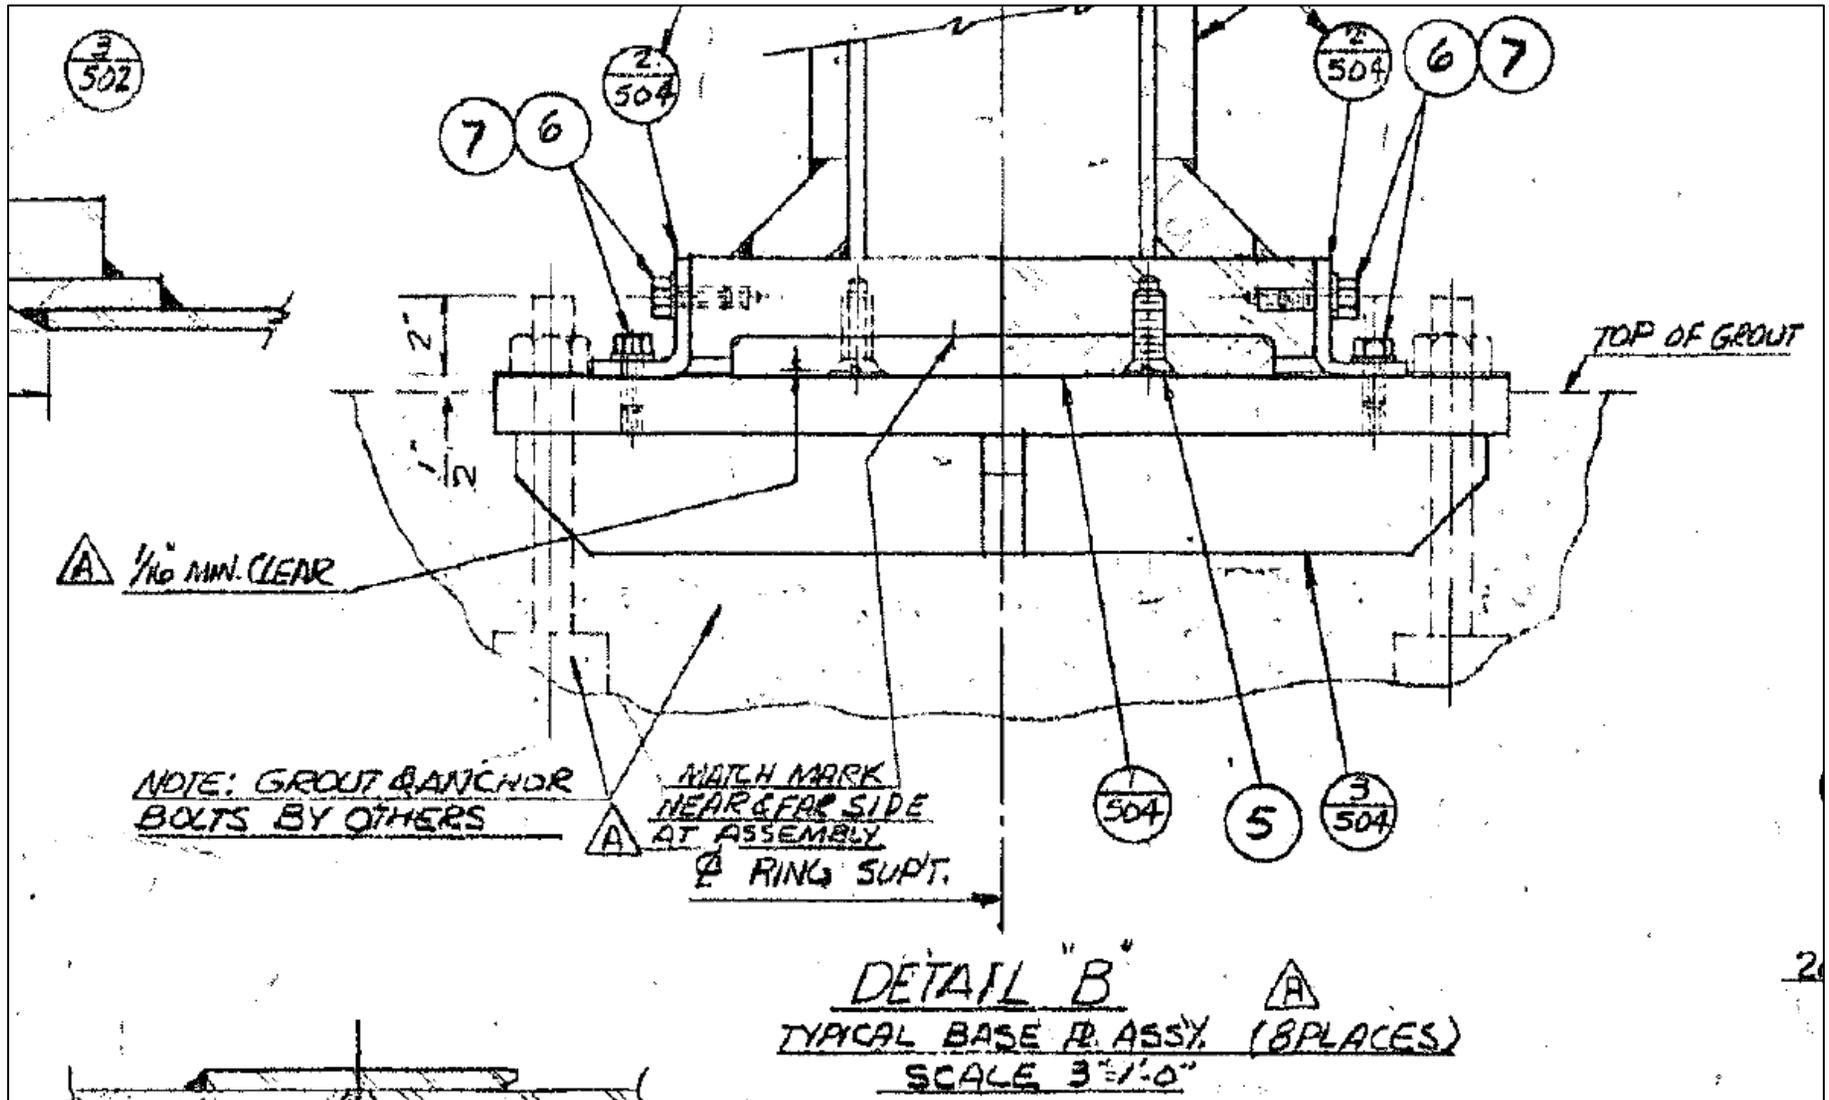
Close-up of Detail B from drawing F-3025A-501, showing the base plate assembly for connecting the penstock ring supports to the concrete pedestals.
